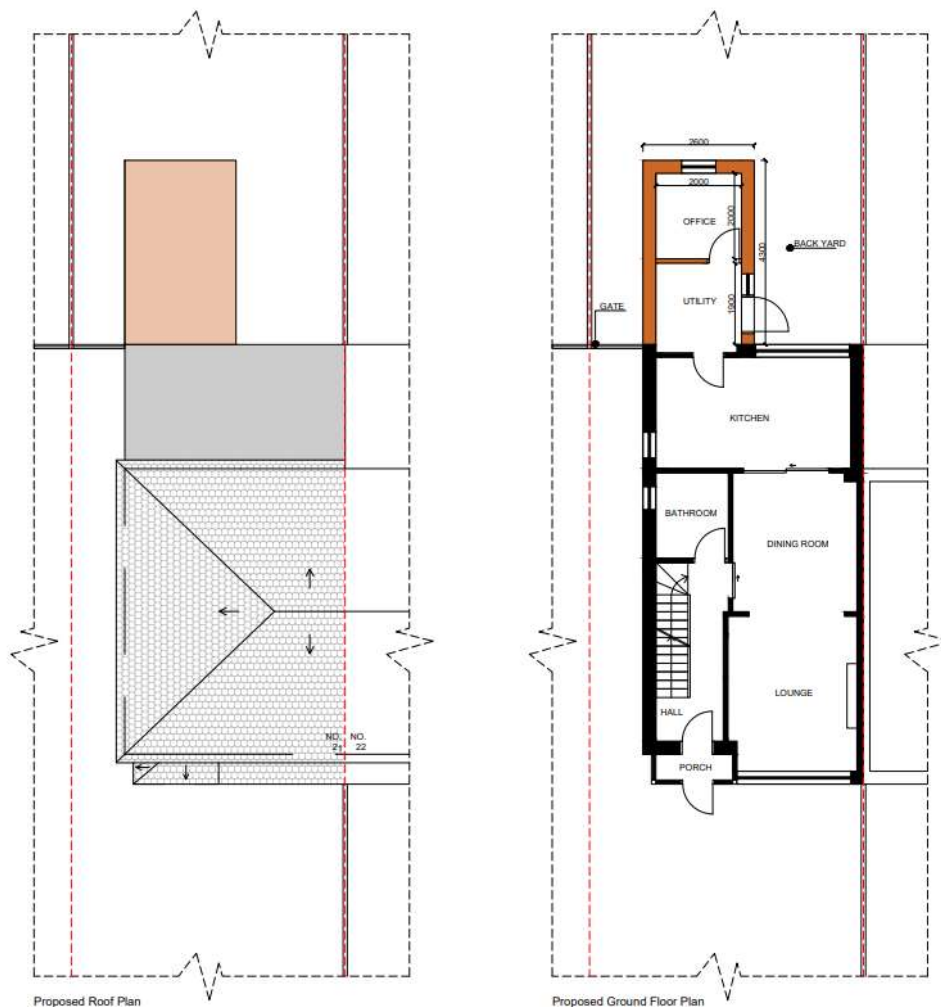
Proposed Plans (Not to scale, see planning drawings and designs)
